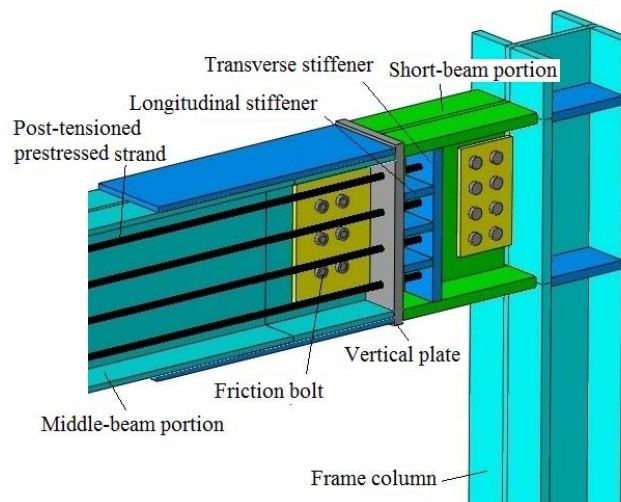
Typical Beam-column Connection of a Self-centering Prefabricated Steel Frame System
